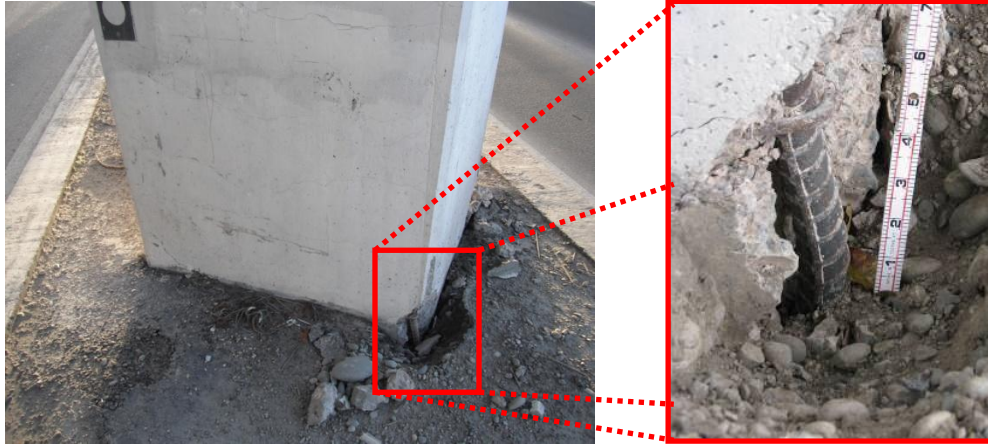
Damaged pier of Port Hills overbridge: detail of buckled reinforcing steel at the base of the pier
